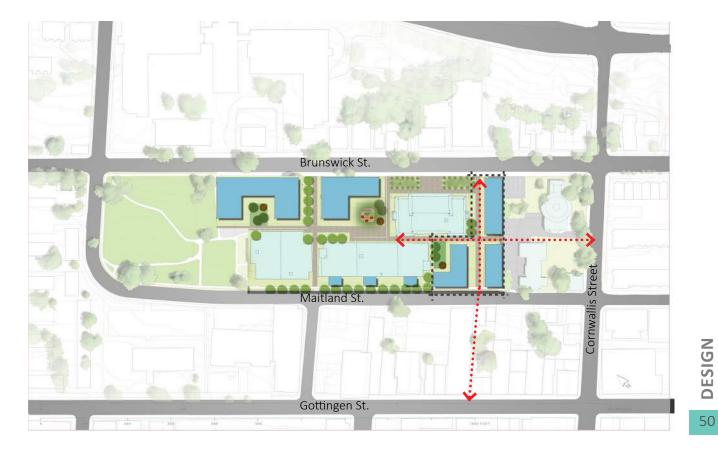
St. Pat's site before construction of phase three (New building envelopes shown in blue)
